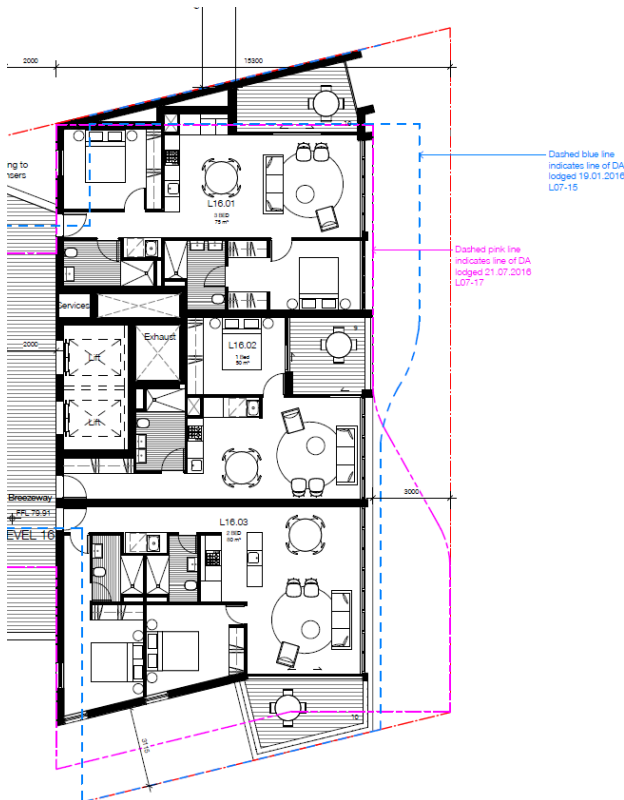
Tower setbacks to Regent Street – Levels 16-17
